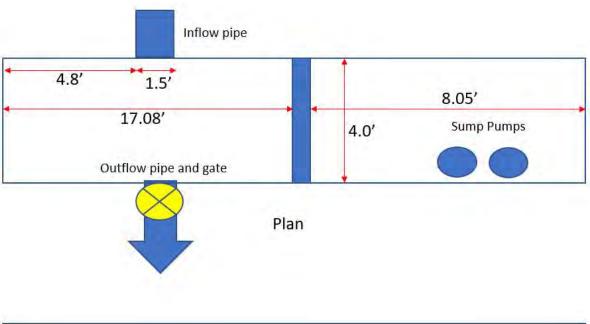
Sample Floodwall Drawing for the Big Bathtub Area (Near Wood Street) Showing the Big Bathtub Sump
